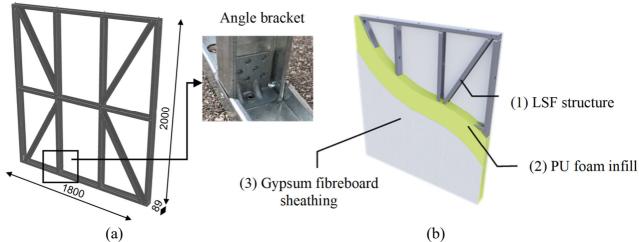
Test specimen for (a) LSF structure and (b) composite wall panel
